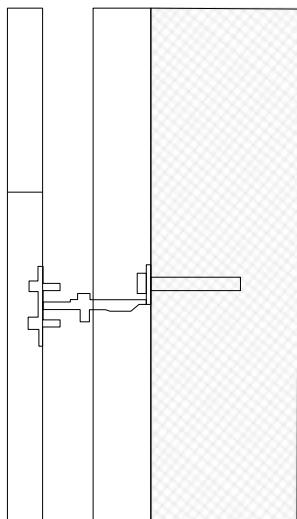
Symbolic section of the exterior wall layers: (1) stone panel $d=6\text{mm}$ (2) steel frame (3) air gap $d=3\text{mm}$ (4) vapour barrier (5) insulation $d=16\text{ mm}$ (6) concrete wall
